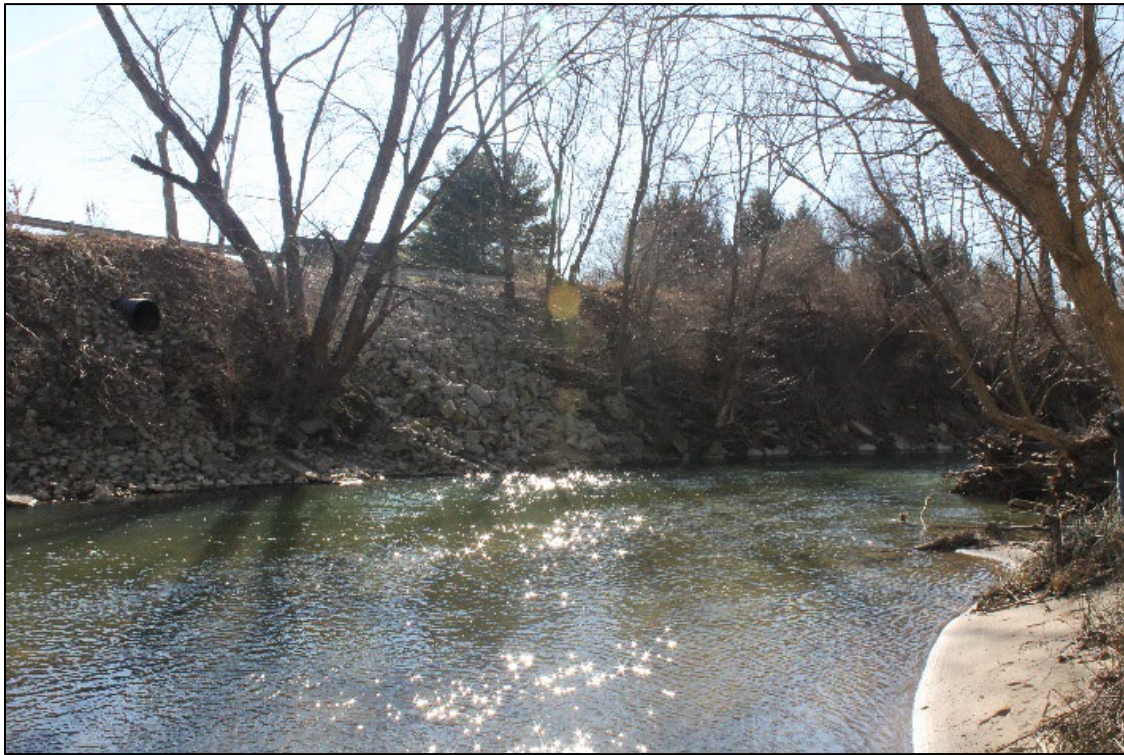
Looking northeast at top of bank at the proposed streambank to be protected along White Lick Creek and South County Road 625 E.
